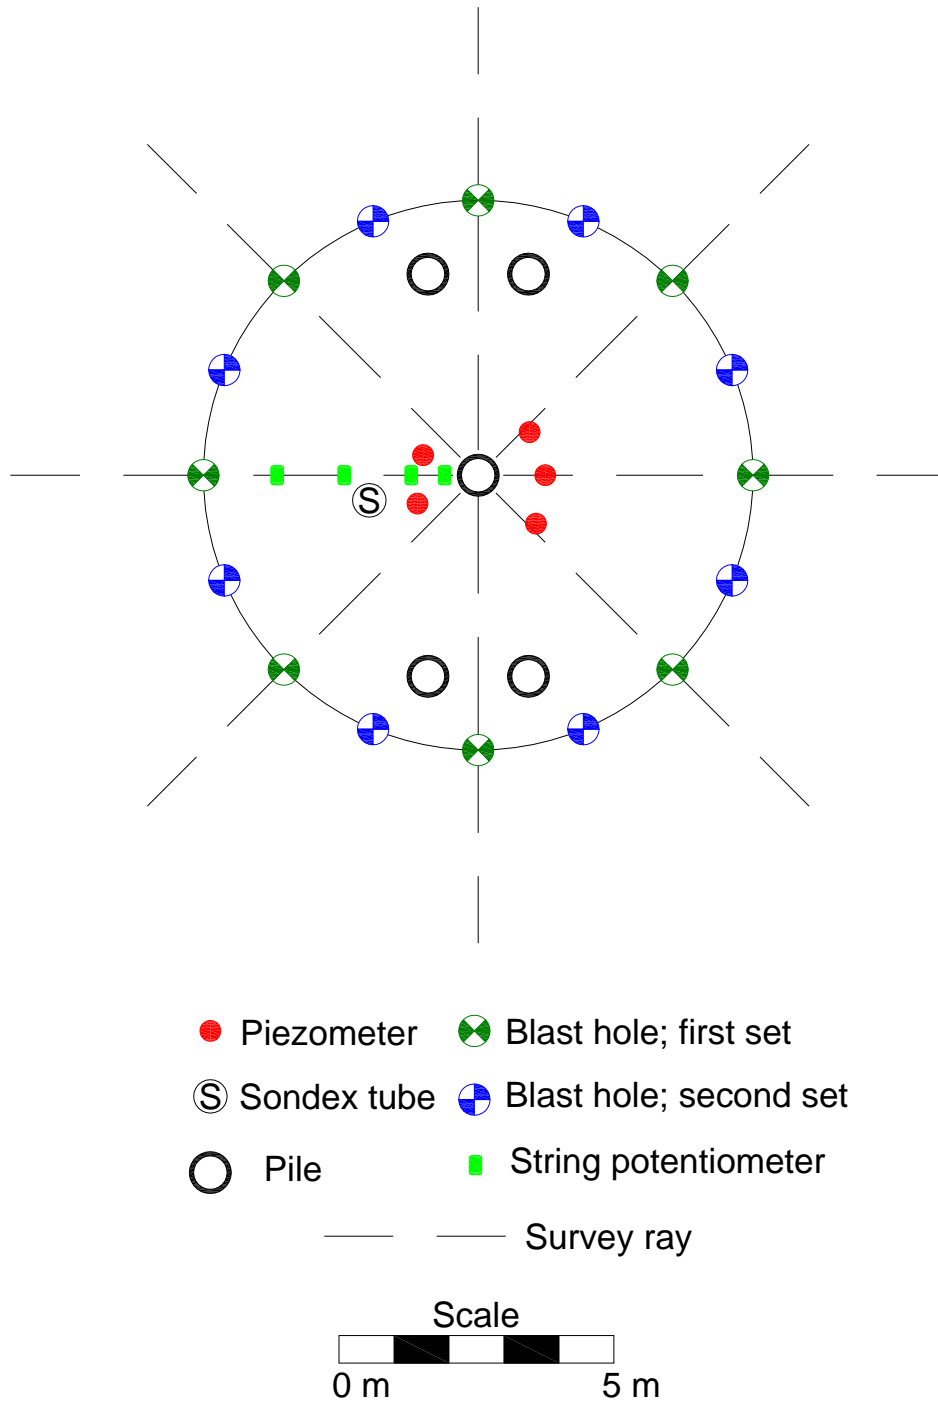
Plan view of pile foundation and instrument layout at Site 2.
